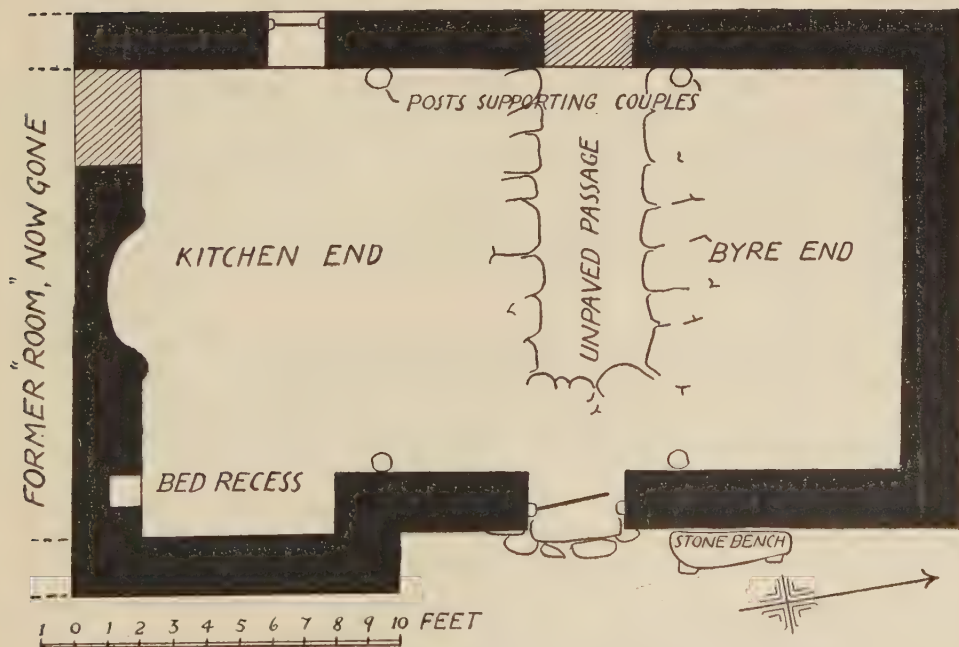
PLAN OF HOUSE B, MEENACREEVAGH, NOW USED AS A STABLE
